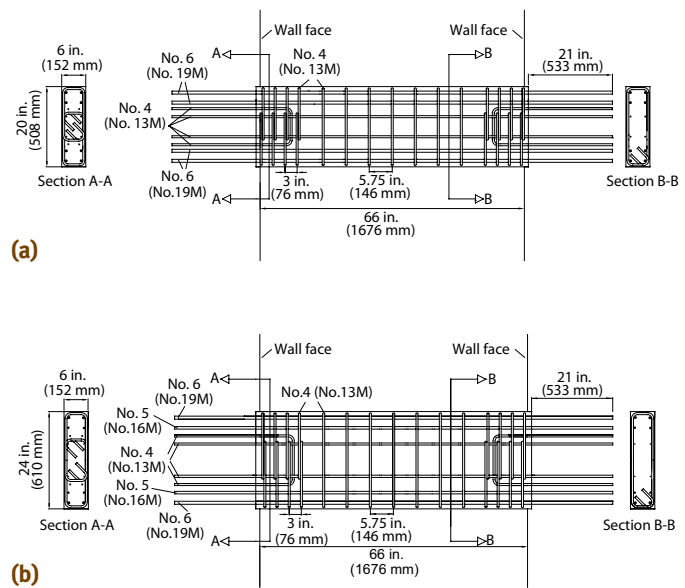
Reinforcement details in test coupling beams: (a) Specimen 1 had an aspect ratio of 3.3; and (b) Specimen 2 had an aspect ratio of 2.75
